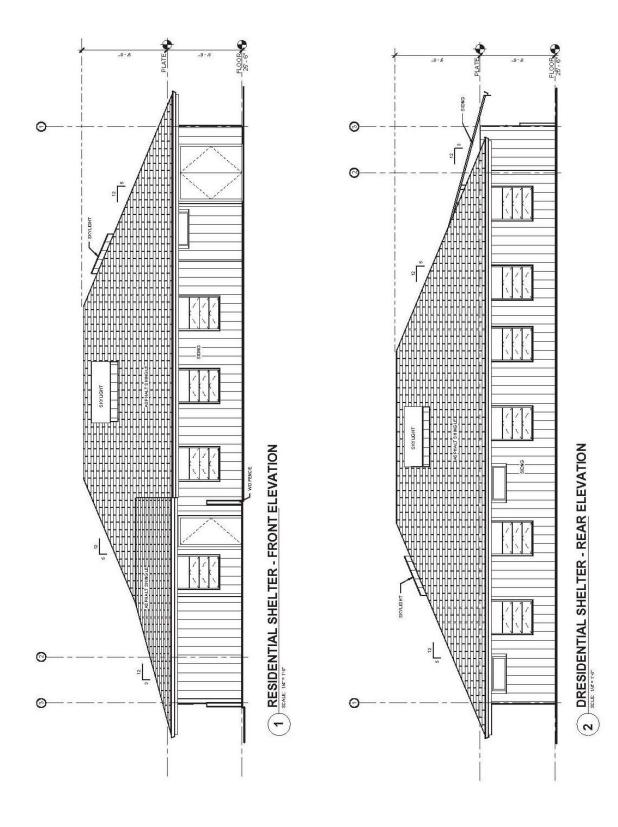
Residential Shelter Exterior Front and Rear Elevations
